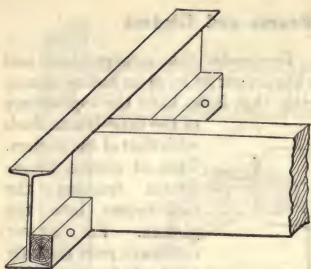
Wooden Beam Framed to I Beam with Wooden Cleat
